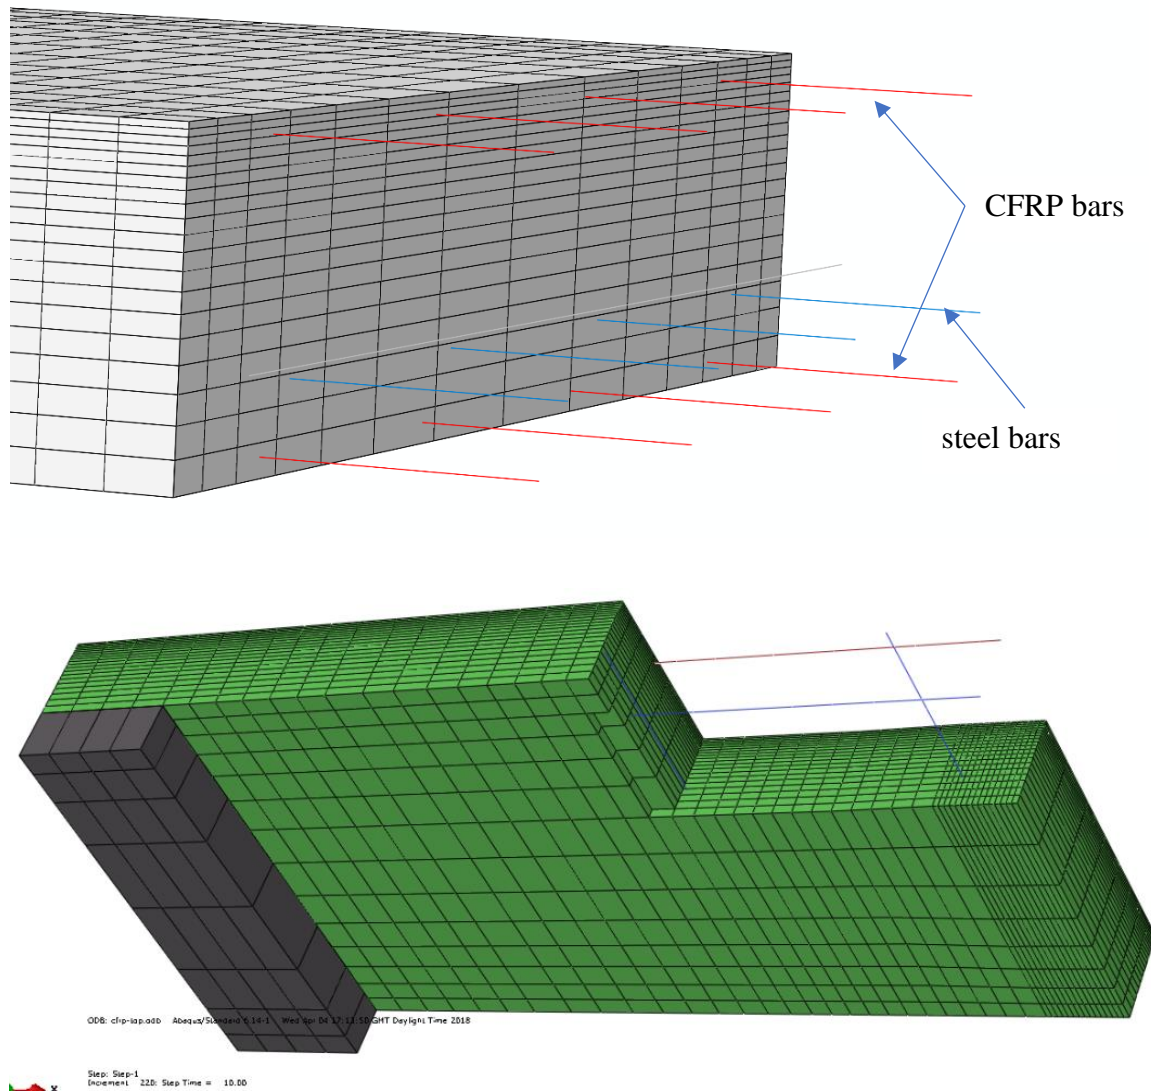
The adopted FE model of the RC slab showing concrete, steel and CFRP bars.
